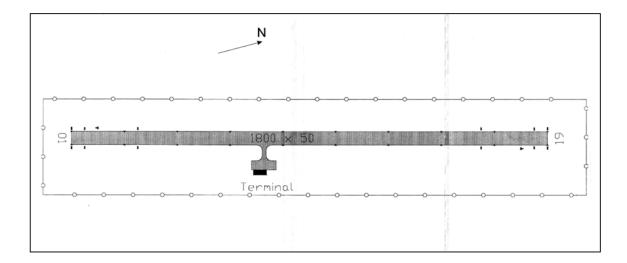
Kharkhorin Sum Airport Layout Plan
